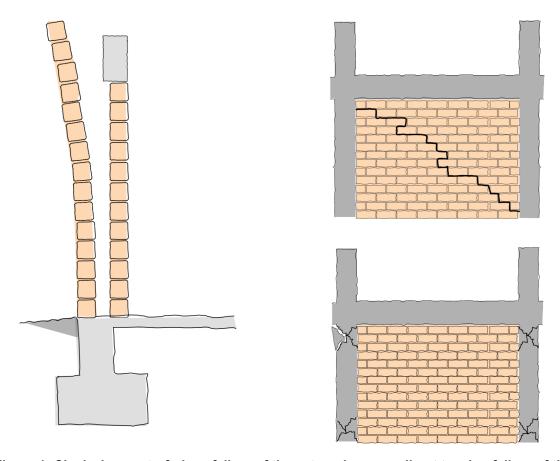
Clockwise - out-of-plane failure of the external veneer, direct tension failure of the URM infill, shear failure of the columns from short column effects
